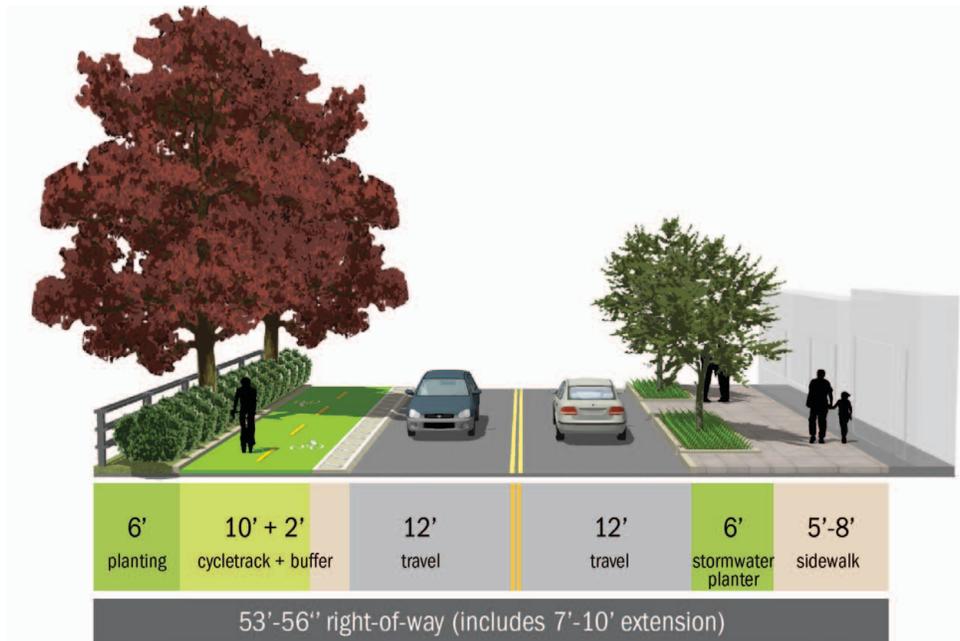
Conceptual Cross-Section for Main Street – South of Milport Road with additional right-of-way and Cycletrack
